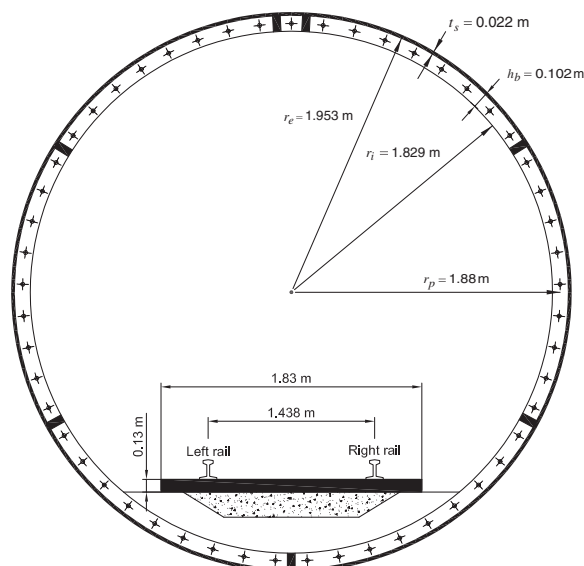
Cross section of the Bakerloo line tunnel of London Underground at Regent's Park.
